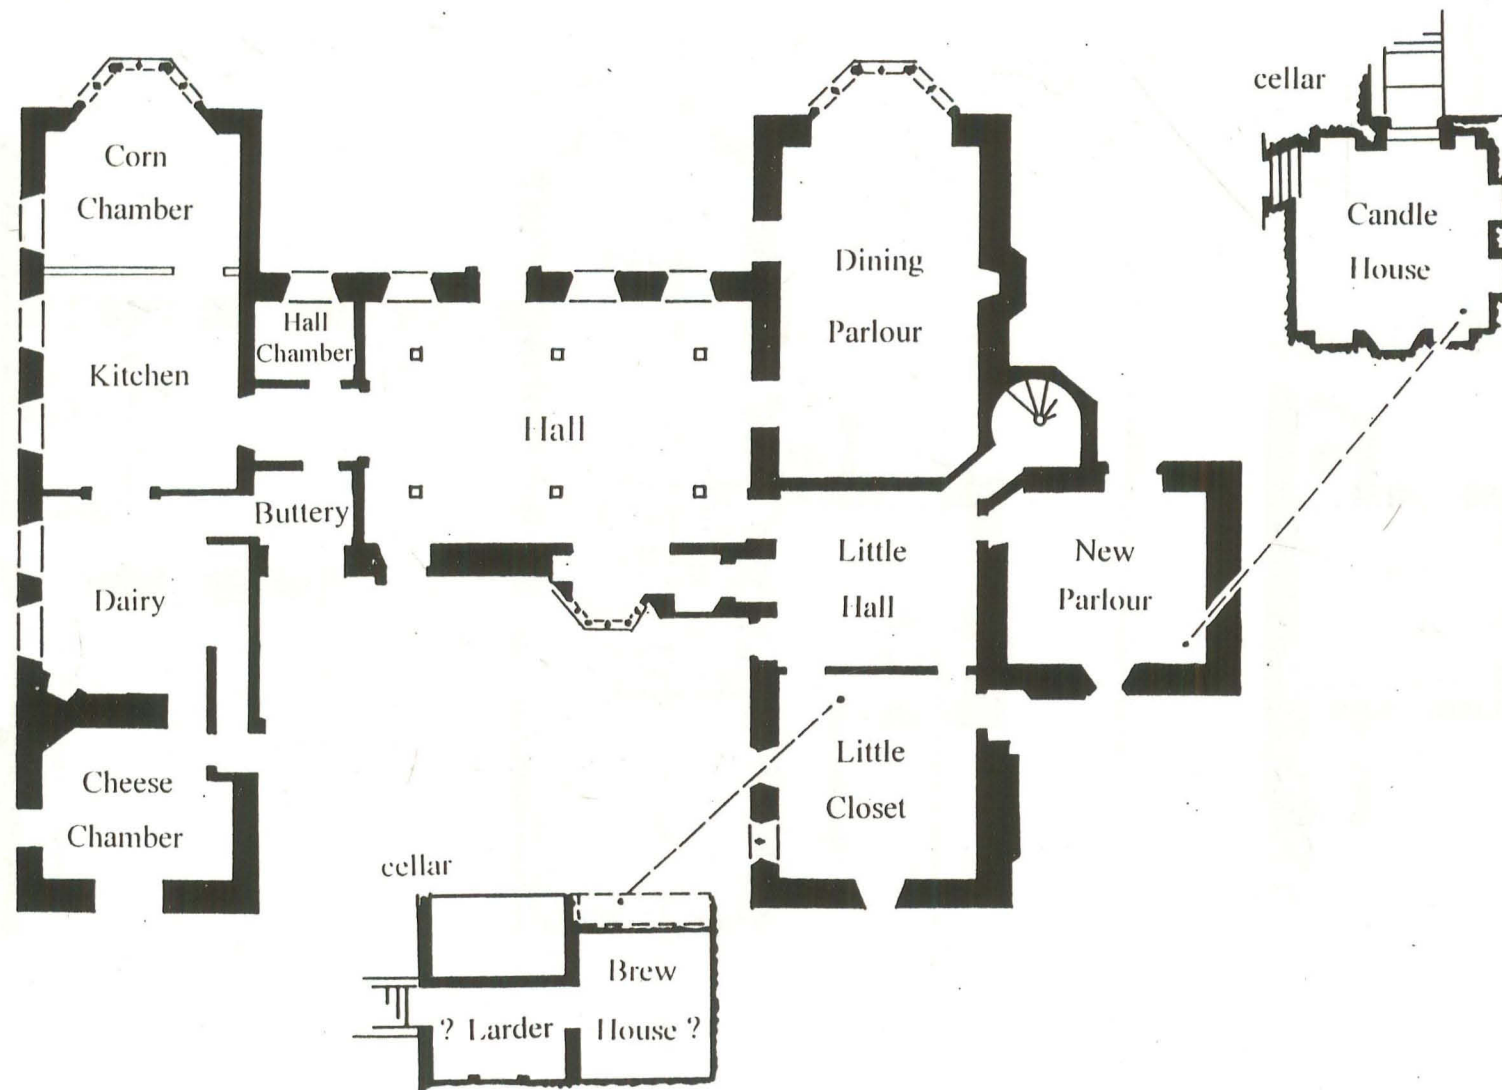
Suggested lay-out of ground floor rooms in 1616,
